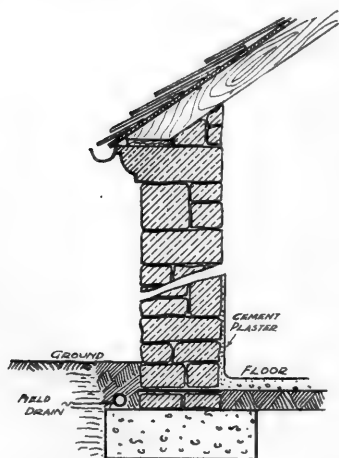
Section of 22 inch thick stone wall showing bond stones, floor slightly below the ground with damp-proof course and field drain surrounded by dry stone infilling to exclude damp.
